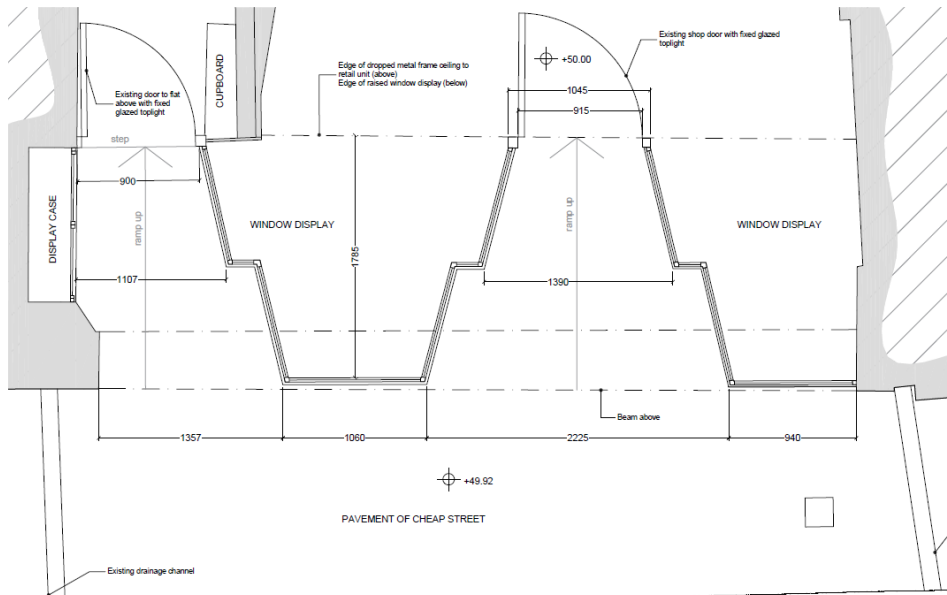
Angel Architecture Ltd drawing No 1922-04 Existing Ground Floor Plan.
